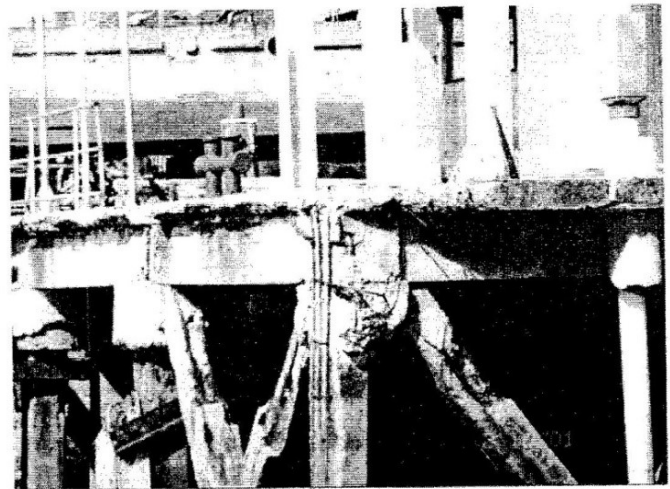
Concrete piers and struts severely corroded at Lighter quay .
